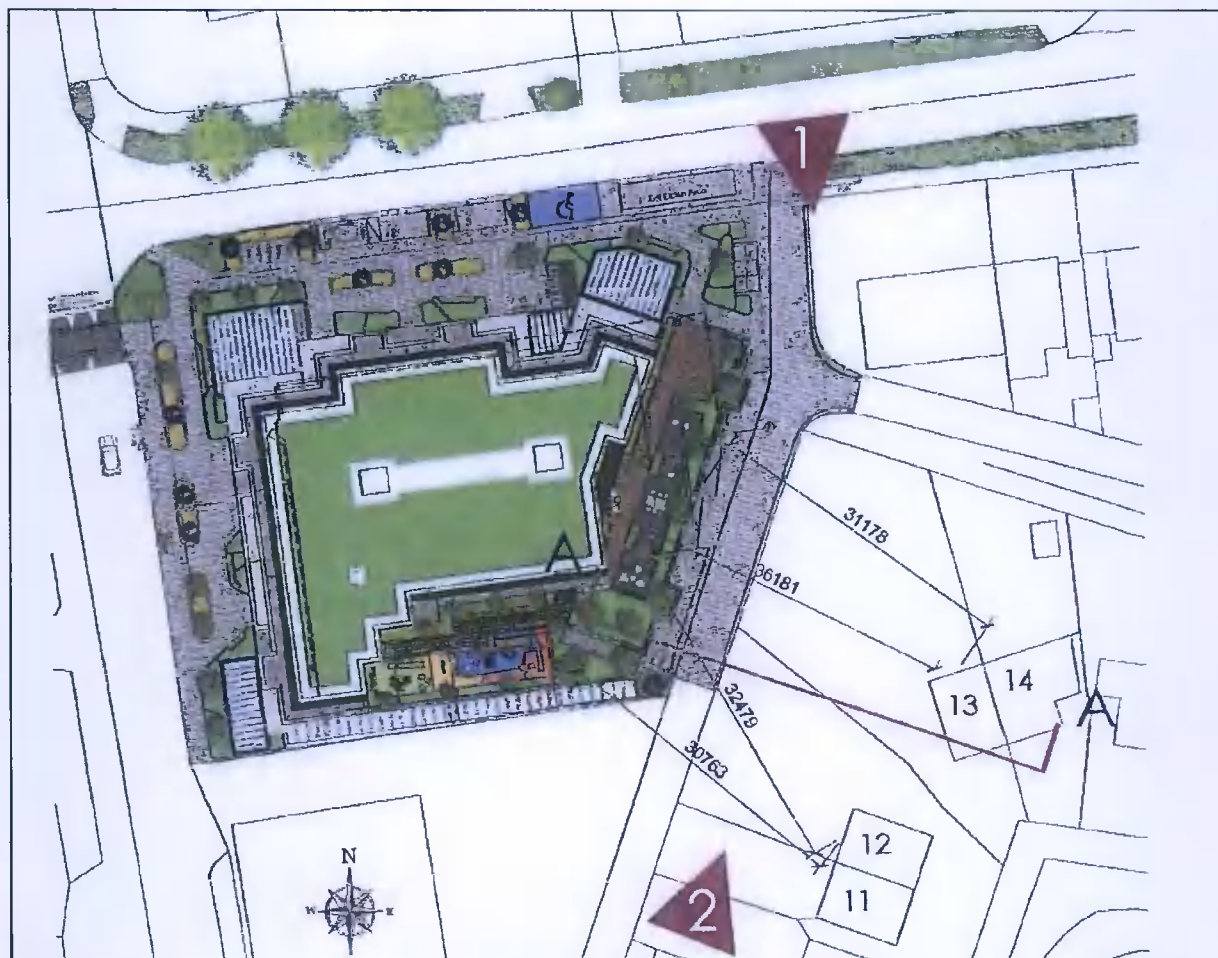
Proposed site layout plan showing separation distances between proposed development and existing dwelling southeast of the subject site (~30.8m and 36.2m)
